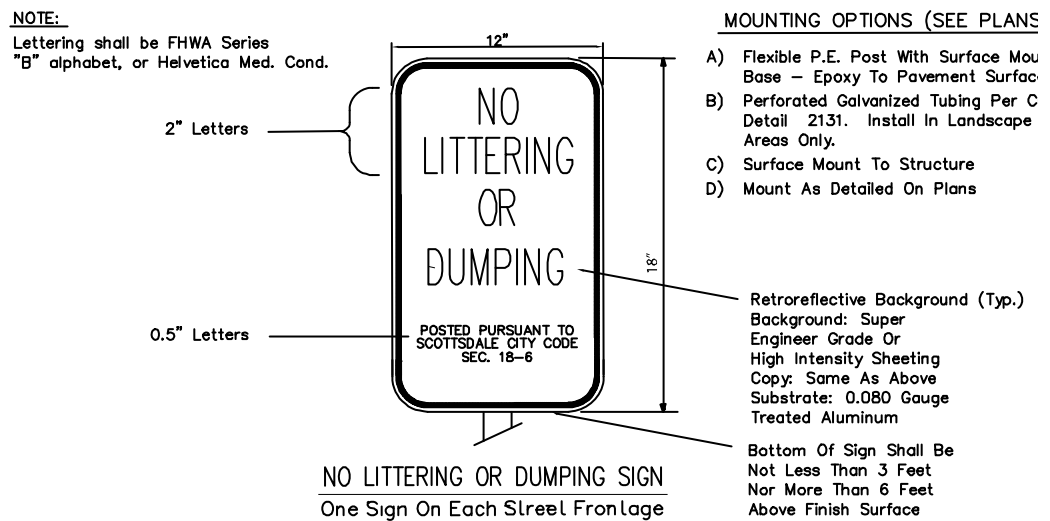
NO LITTERING OR DUMPING SIGN
